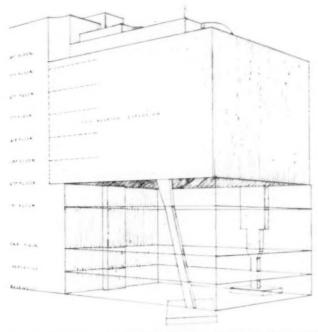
Diagrammatic Sketch showing the Method of Supporting the New Extension.
